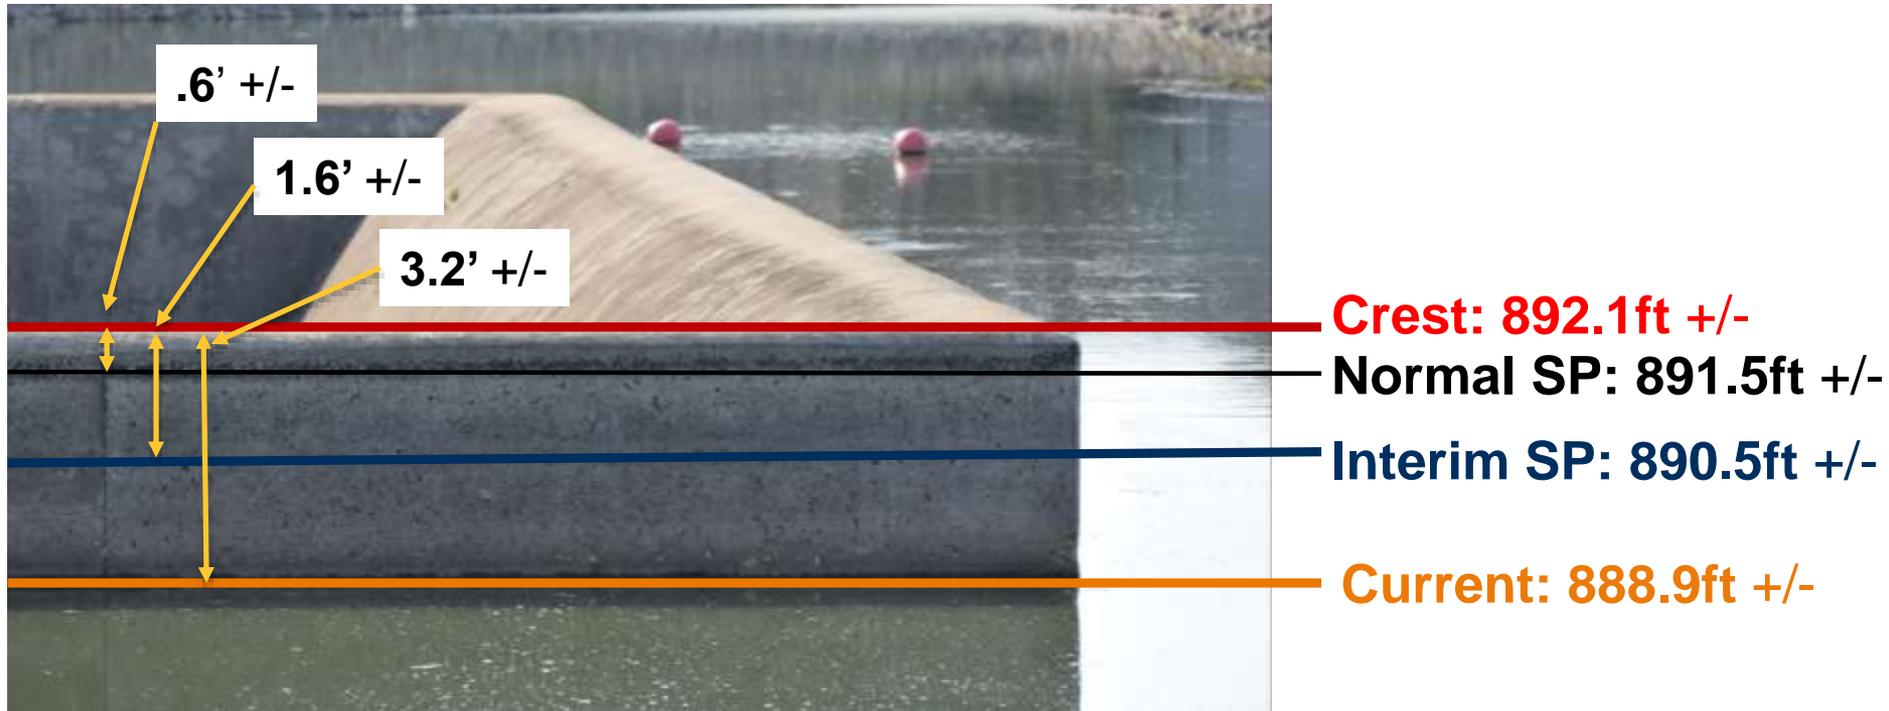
Image not to scale. 7-26-16 Elevation at USGS Millersport Gauge (8am).
